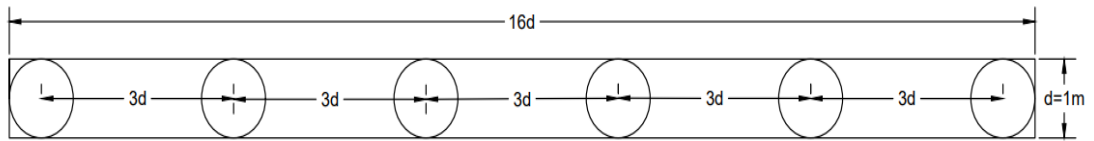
6 pile arrangement with 16 sqm. Raft size
